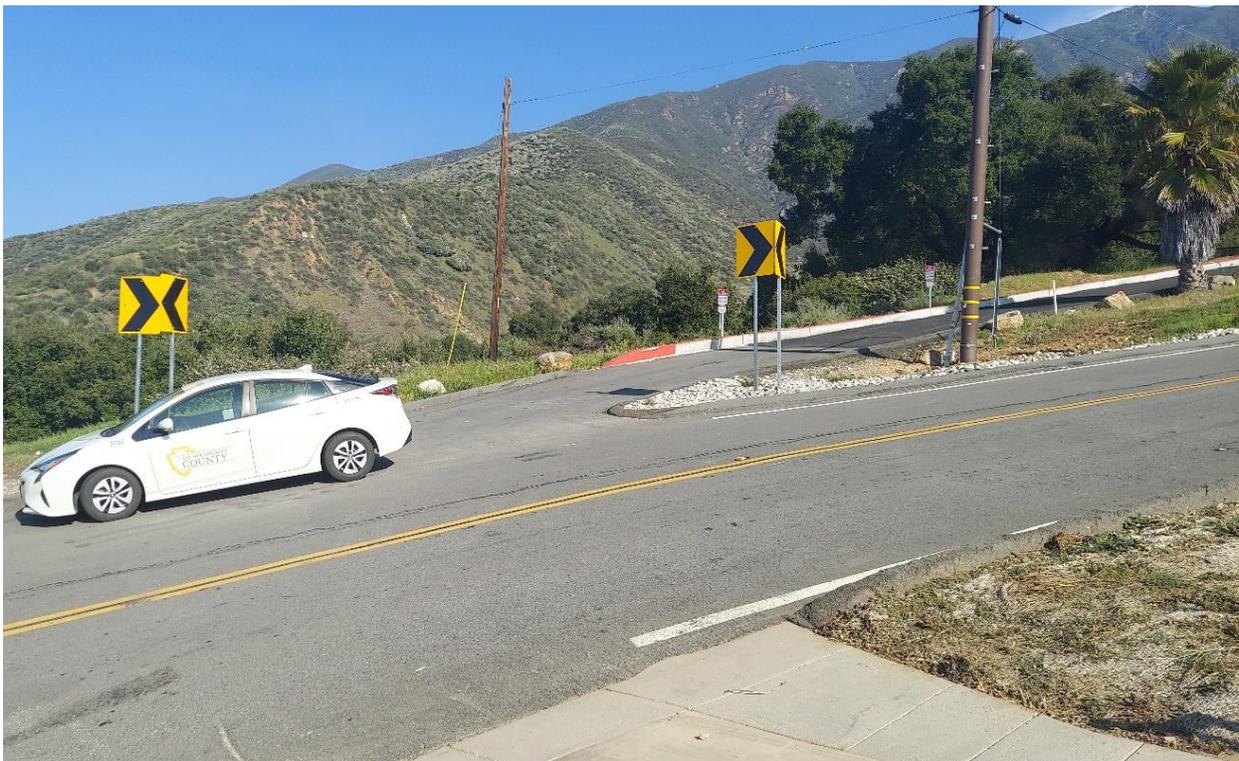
(Location #1) Santina Street at Archibald Avenue looking north at 4571 Archibald Avenue driveway, at turning curve.
